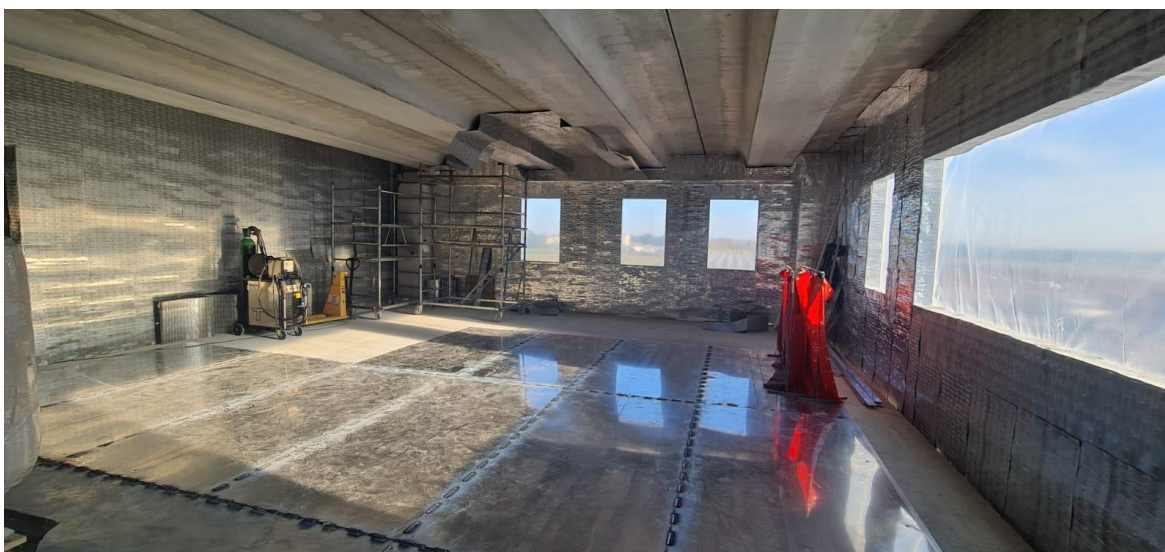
installation on walls (ArmoFlex) and ceiling (SuperFlex) and floor (ArmoFlex+Aluminum panels)
